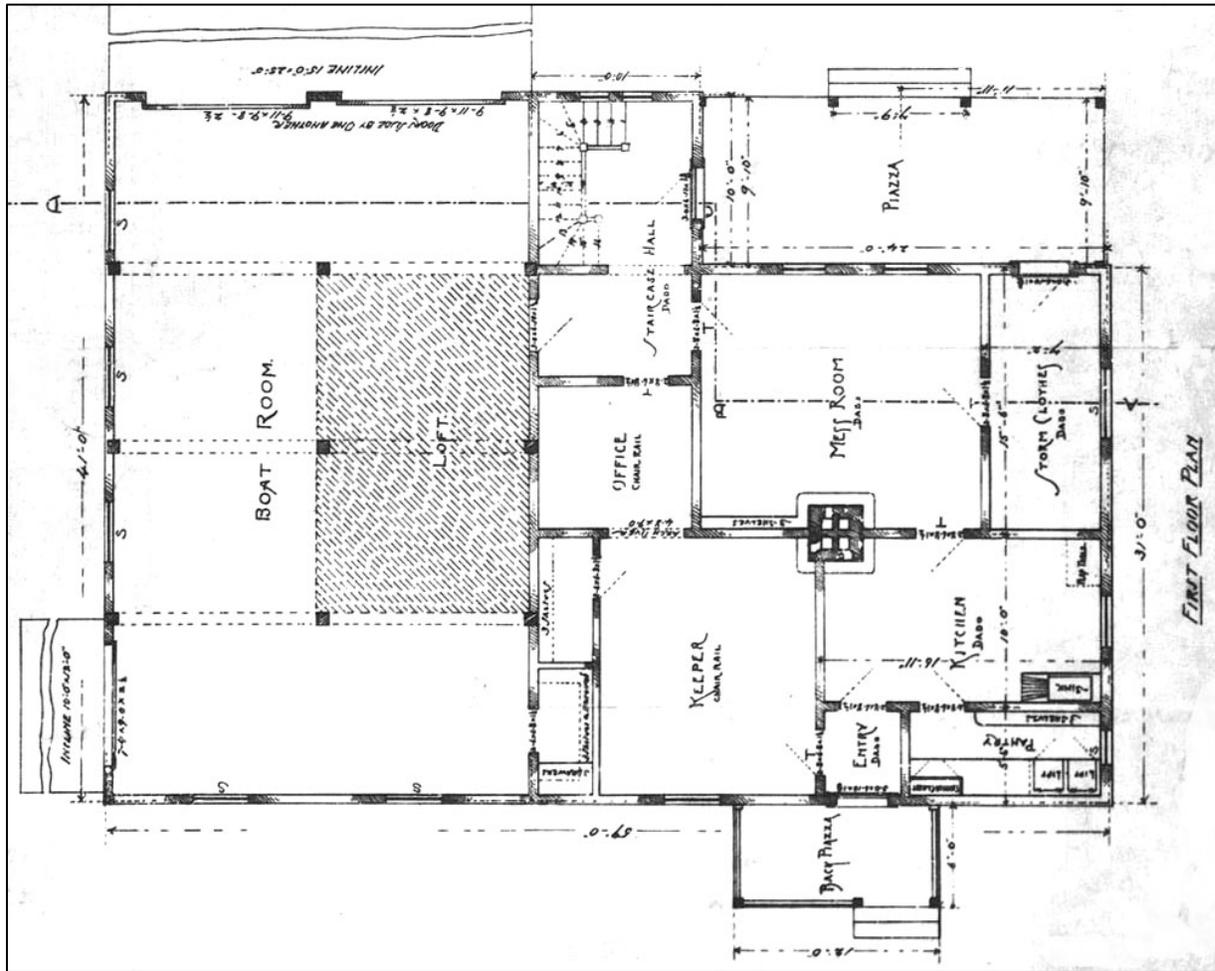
Duluth-type life-saving station first story plan copied from drawing No. 1.
